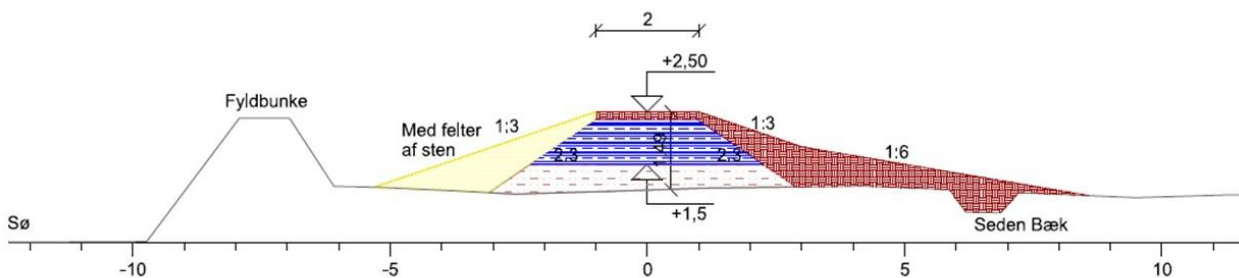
Cross section drawing of the new dike with nature plugins.
